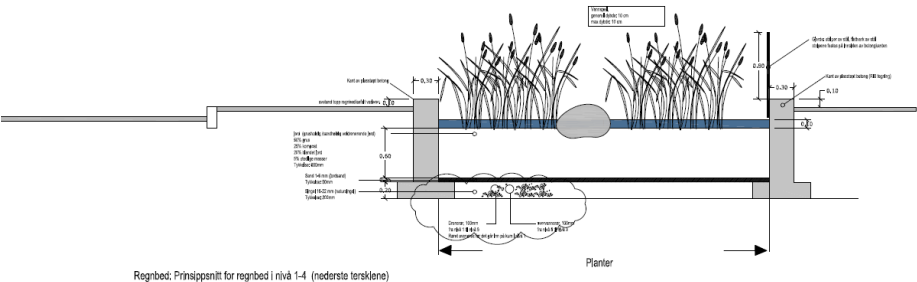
Cross section illustration of the Åsveien raingarden section 1, 2, 3 & 4.
